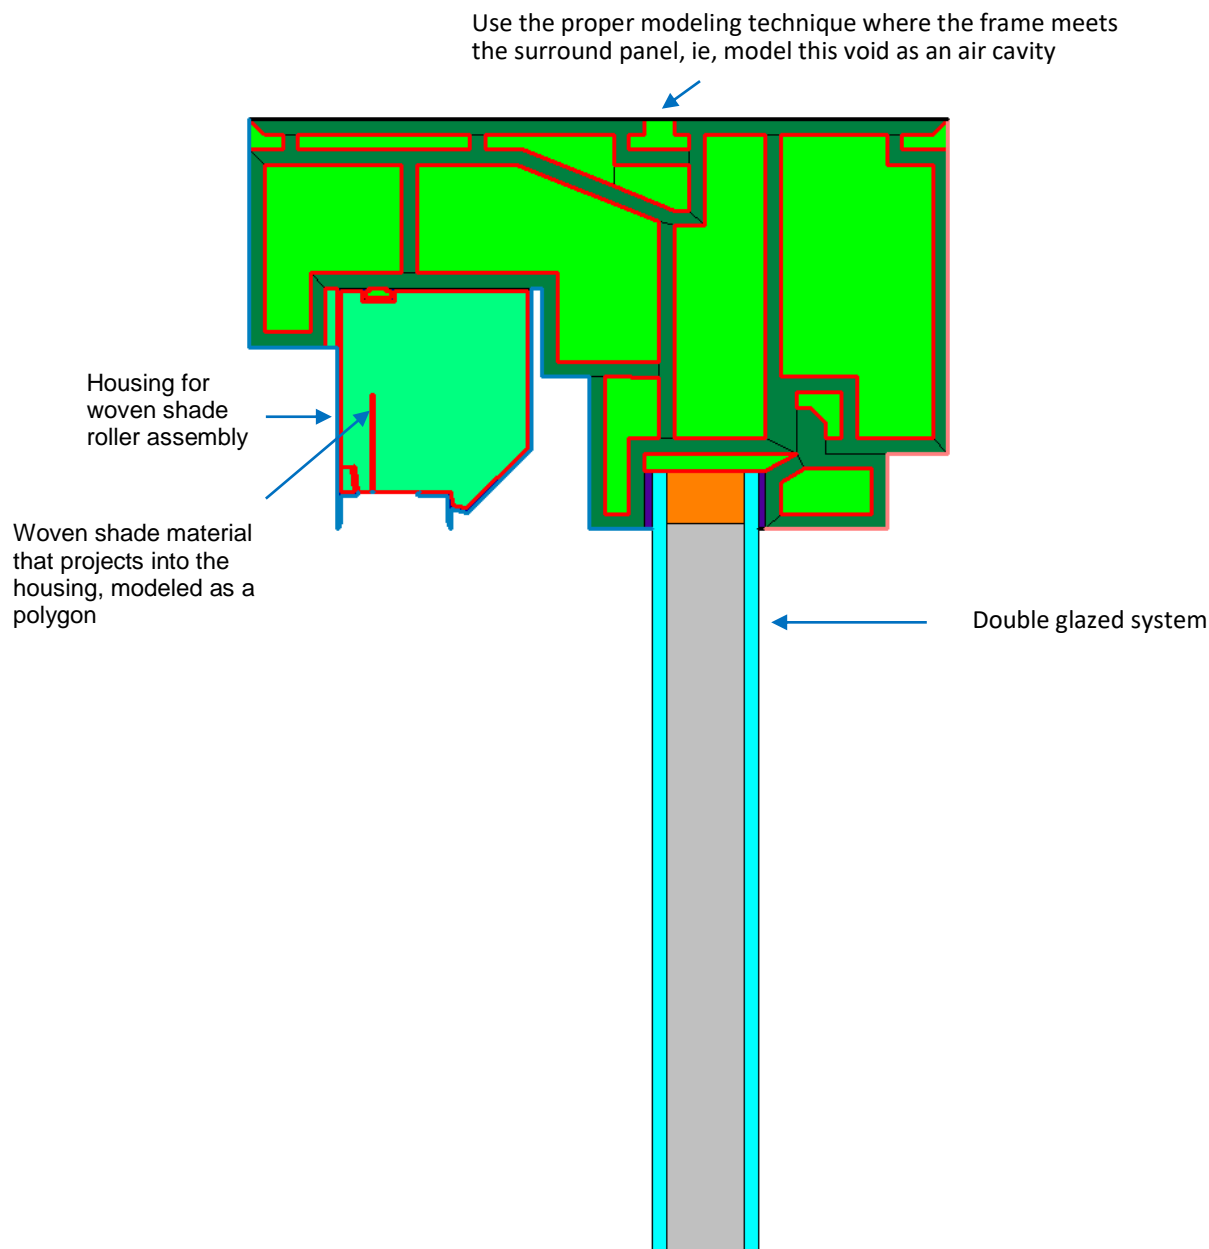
Head cross section with fully retracted woven shade with a double-glazed system.
